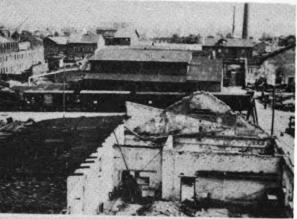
View looking east, showing debris cleared bldg. Plast and fire destroyed wood framing of roof. Bldg. 57 in background.
